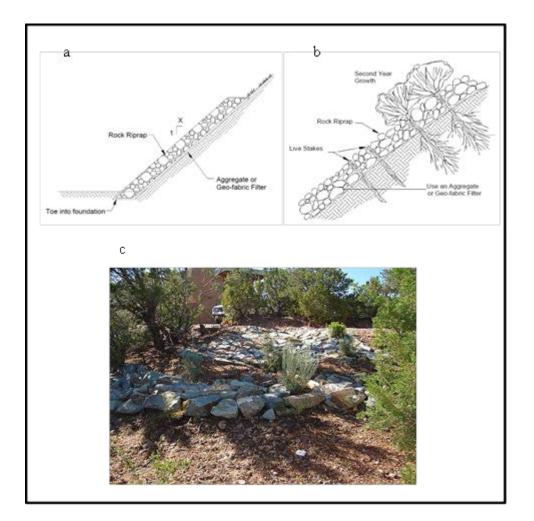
Examples of natural soil reinforcement materials being used to stabilize soil from water and gravity erosion: (a) mixed rock or riprap revetment, (b) vegetation riprap revetment, and (c) a photograph of a vegetation and light riprap revetment. (Illustrations (a) and (b) are from Kearley and McCallister, 2000; (c) is from the California Department of Transportation website www.dot.ca.gov, accessed September 29, 2013).
